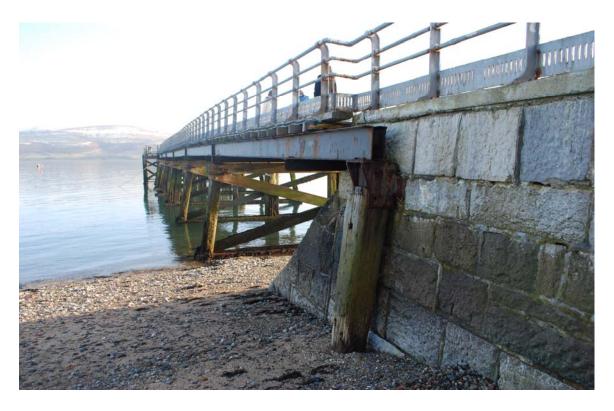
Detail showing the junction of the stone and wooden pier sections, from the north north east
